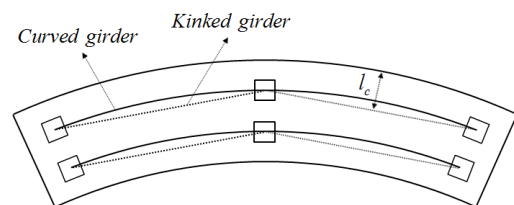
Kinked girders and curved girders in horizontally curved bridges
